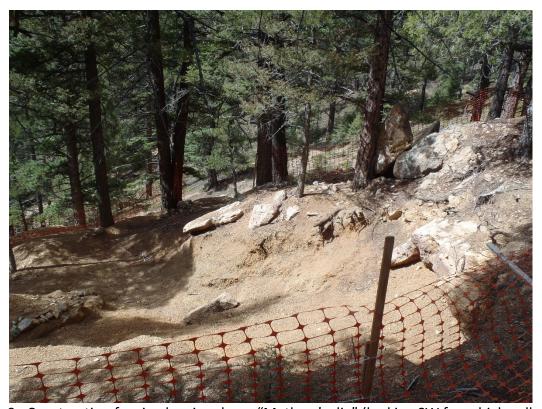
Construction fencing barrier above "Mathew's dig" (looking SW from highwall crest).
